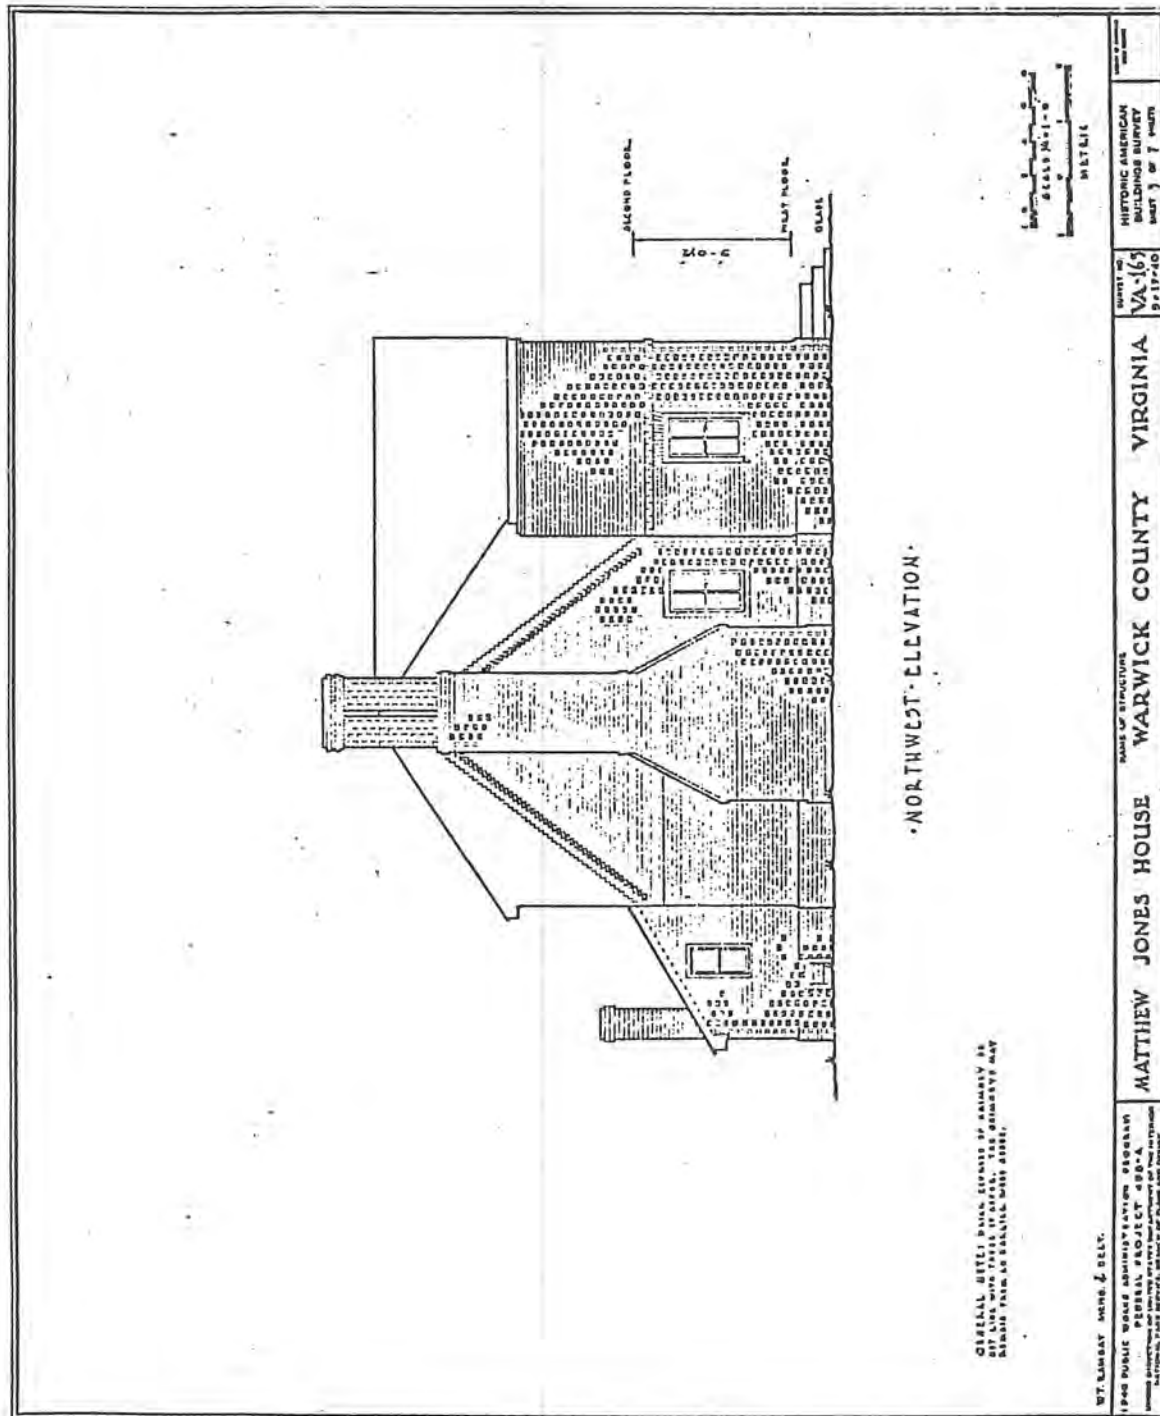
Matthew Jones House, HABS drawing (1940), northwest elevation.
